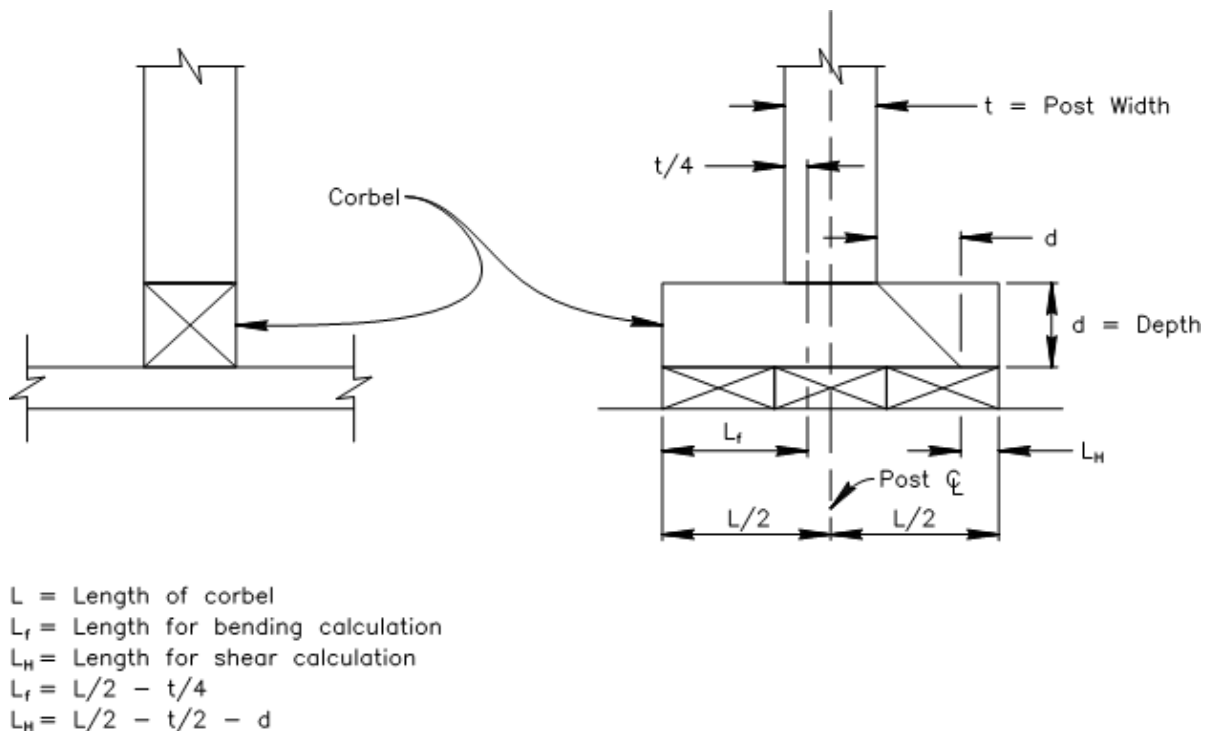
Timber Corbel Flexure and Shear Dimensions.
